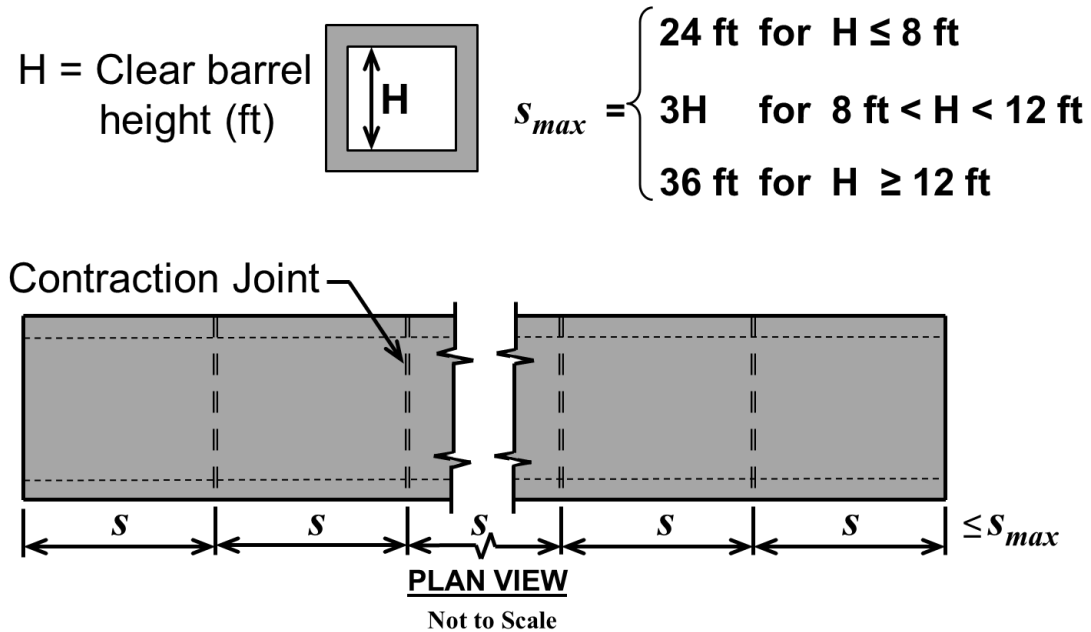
Recommended Contraction Joint Spacing and Box Culvert Clear Height
